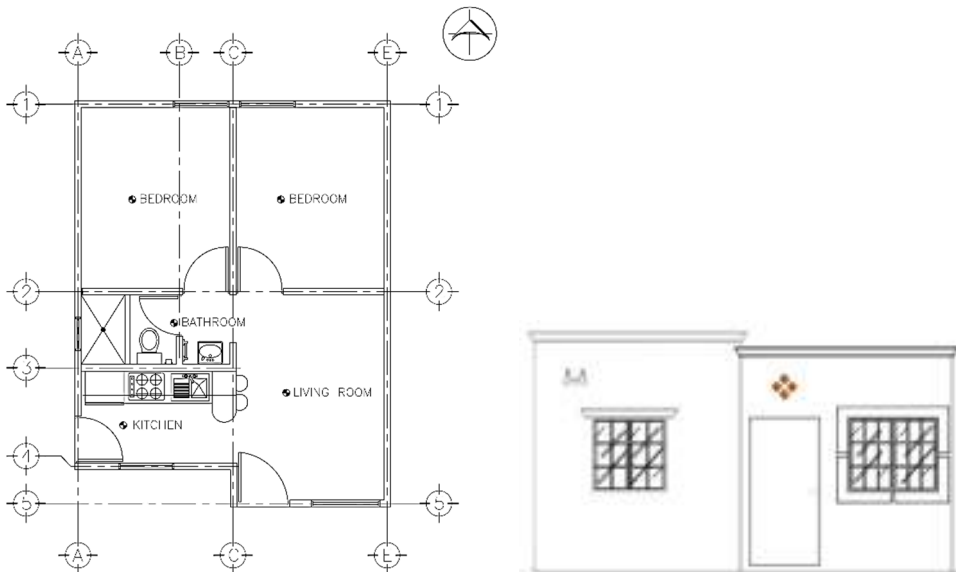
Benchmark case (BC). (Source: Authors, from the housing prototype plans, 2011.)
